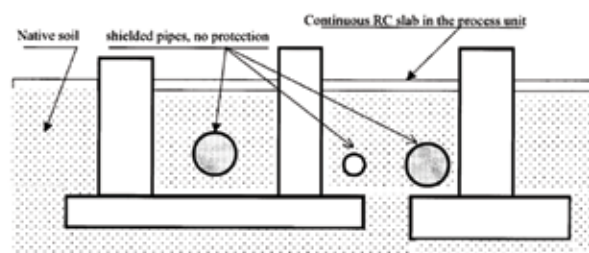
A Typical Process Piping Layout Where Reinforced Concrete Foundations are Restricting The Flow of Protective Current.
